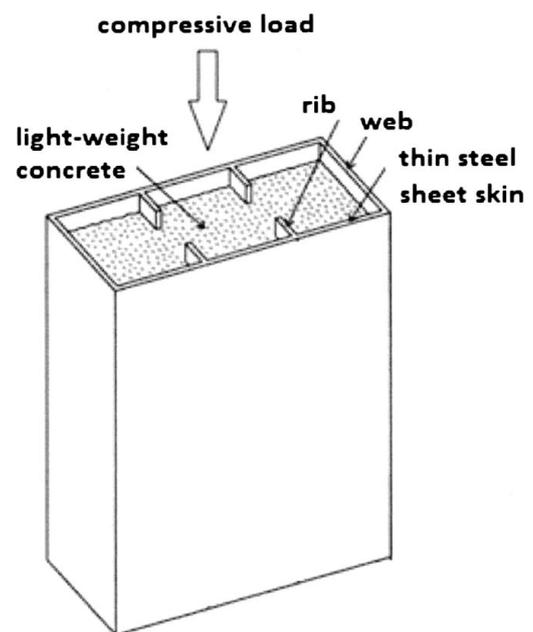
Sandwich panel systems with thin steel skins and lightweight concrete
